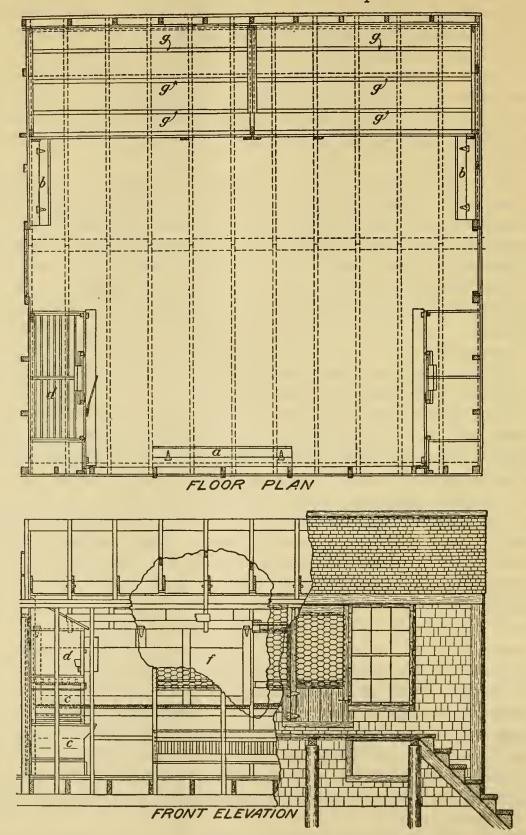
Floor plan and front elevation of section of latest curtain-front poultry house. a, Feed trough for dry mash; b, feed trough for grit, bone, etc.; c, trap nest; d, coop for broody hens; e, front curtain; f, roosting closet curtain; g, roost bars; h, small closet in which eggs taken from nest are placed.
